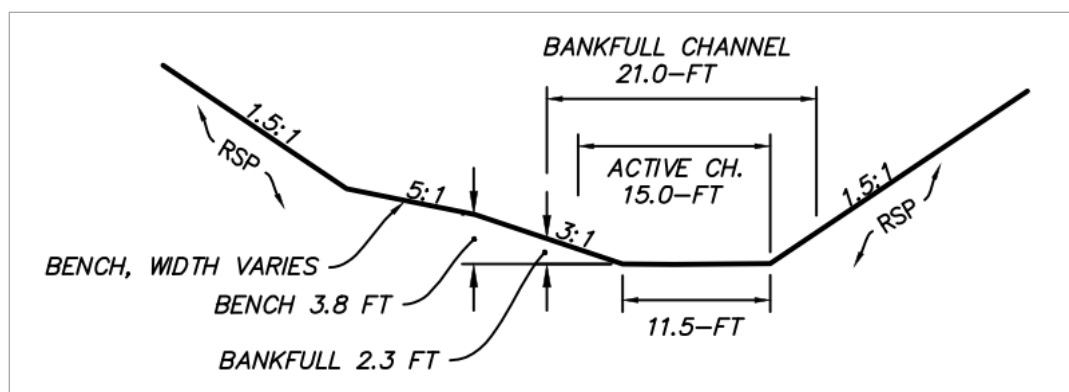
Typical channel geometry under the bridge for Robinson Creek at Lambert Lane Bridge replacement.
